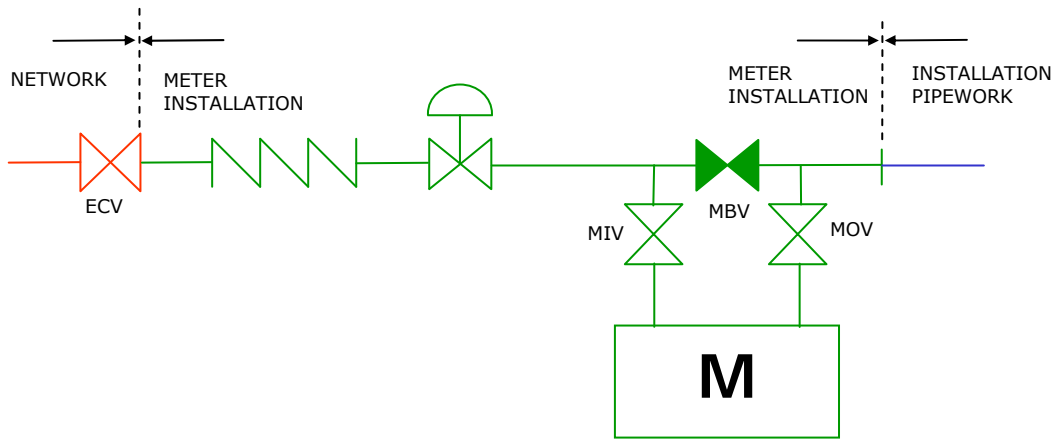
RECOMMENDED ARRANGEMENT.
